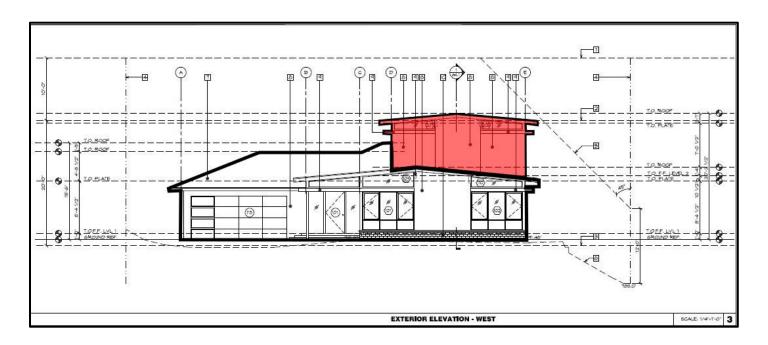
Front (west) elevation of proposed development with additions shown in red
